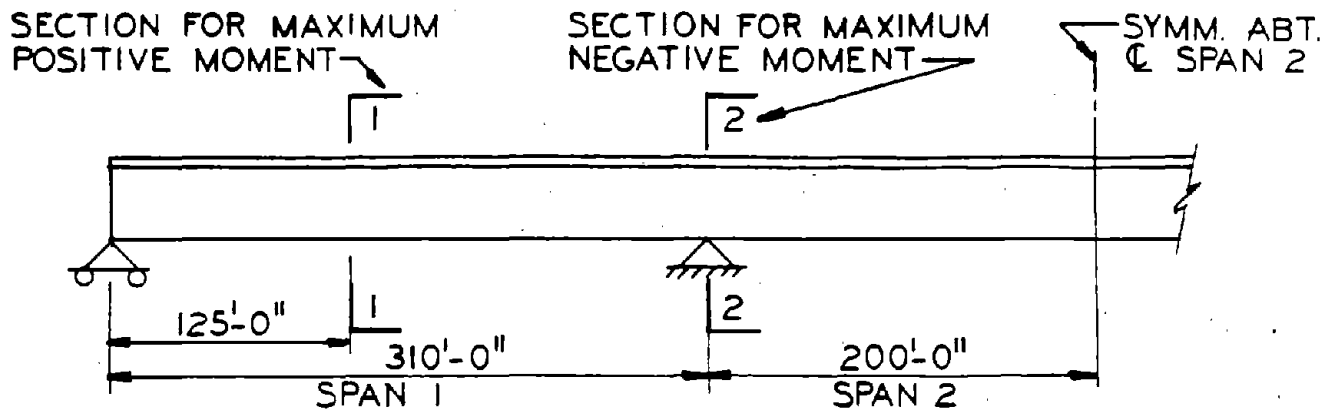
PART ELEVATION OF STRUCTURE SHOWING SECTIONS TO BE DESIGNED
